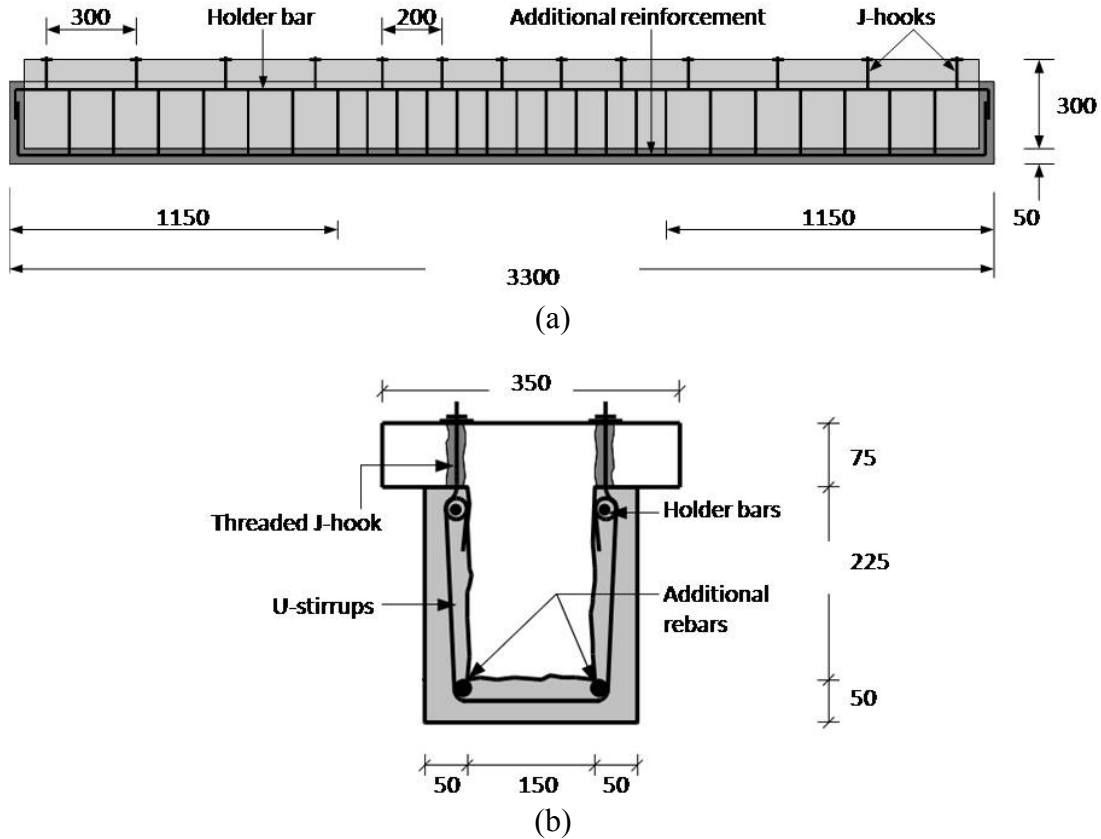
Sectional details for retrofitted beam specimens (all dimensions are in mm): (a) sectional elevation; (b) cross-section
